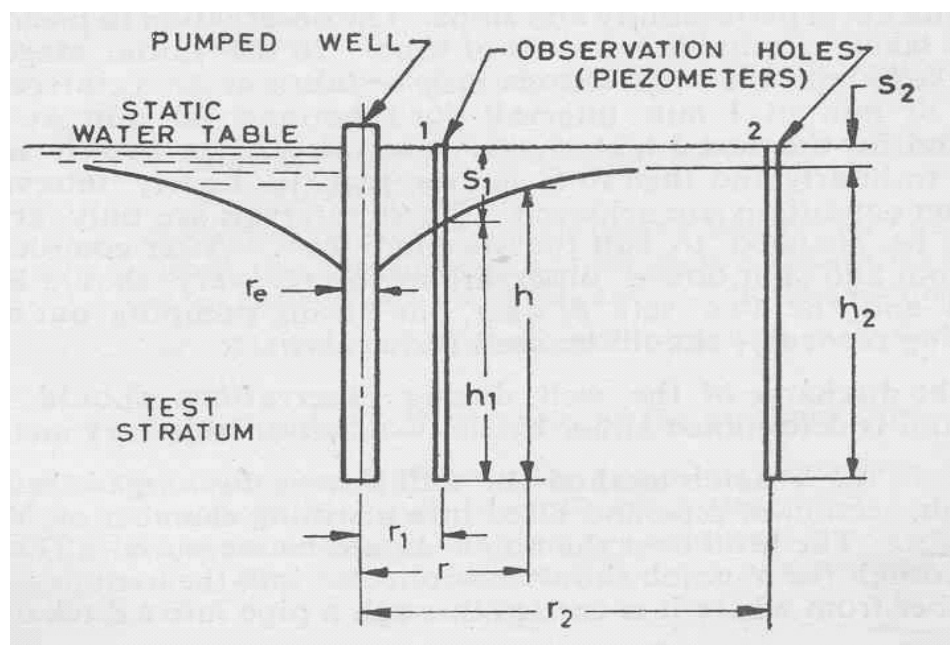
TYPICAL ARRANGEMENT FOR PUMPING OUT TEST
